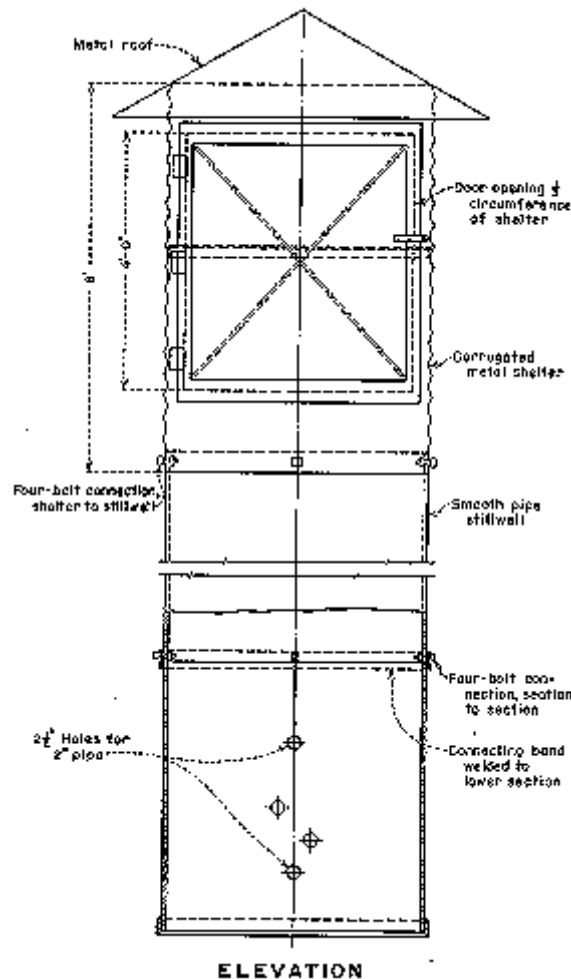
Plans for smooth and corrugated steel pipe recorder housing and stilling wells (sheet 2 of 2).
